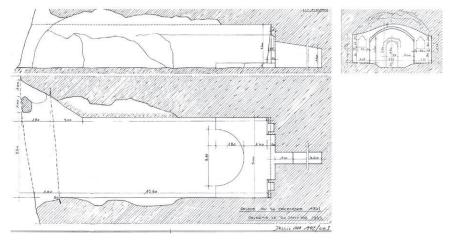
Proposed mithraeum found at Avenches *Pré-Mermoud*, plan and section, 1942 (Roman Museum archive, drawing L. Bosset).
